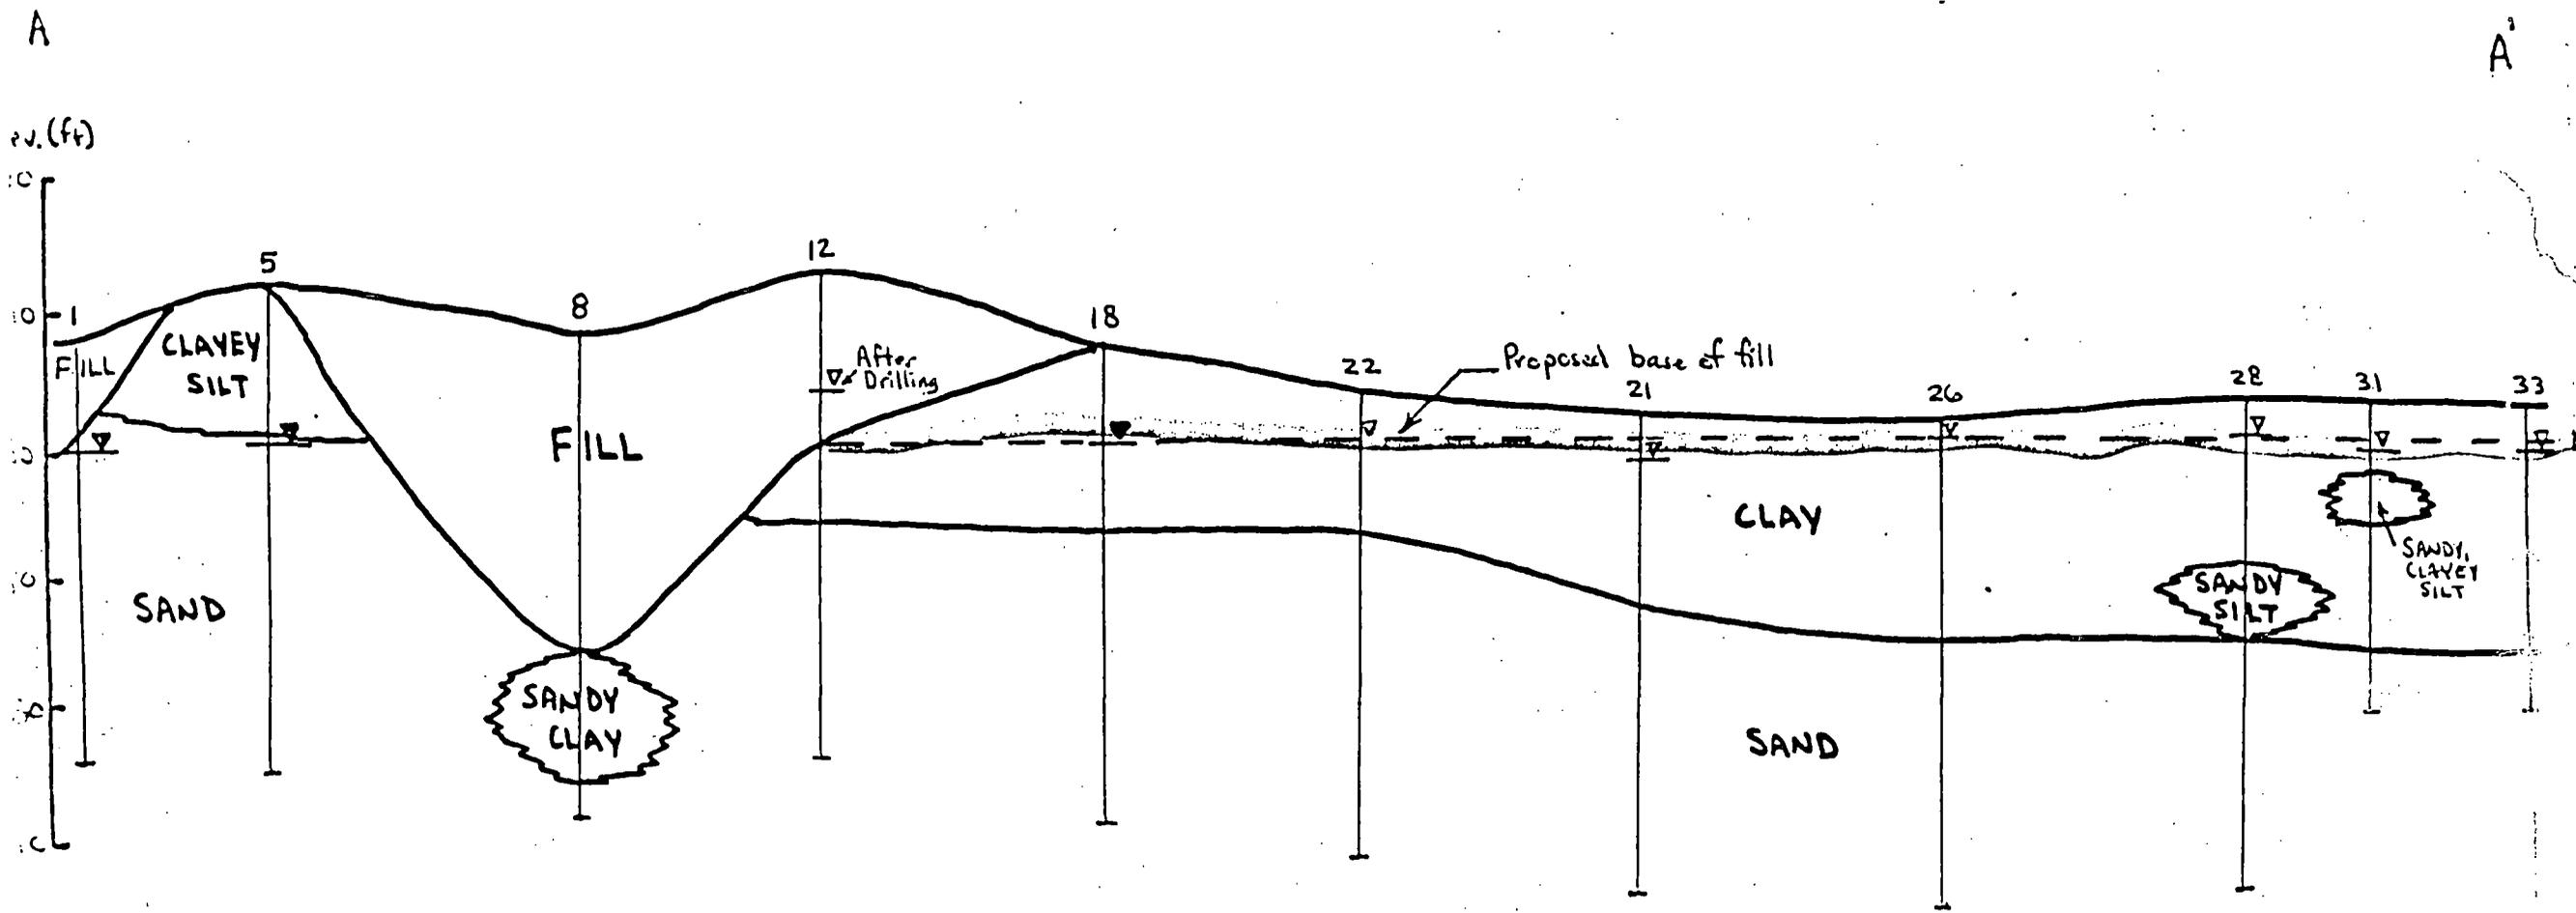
Schematic SW-NE cross section of East St. Louis/SCA-Milam landfill, St. Clair Co.
